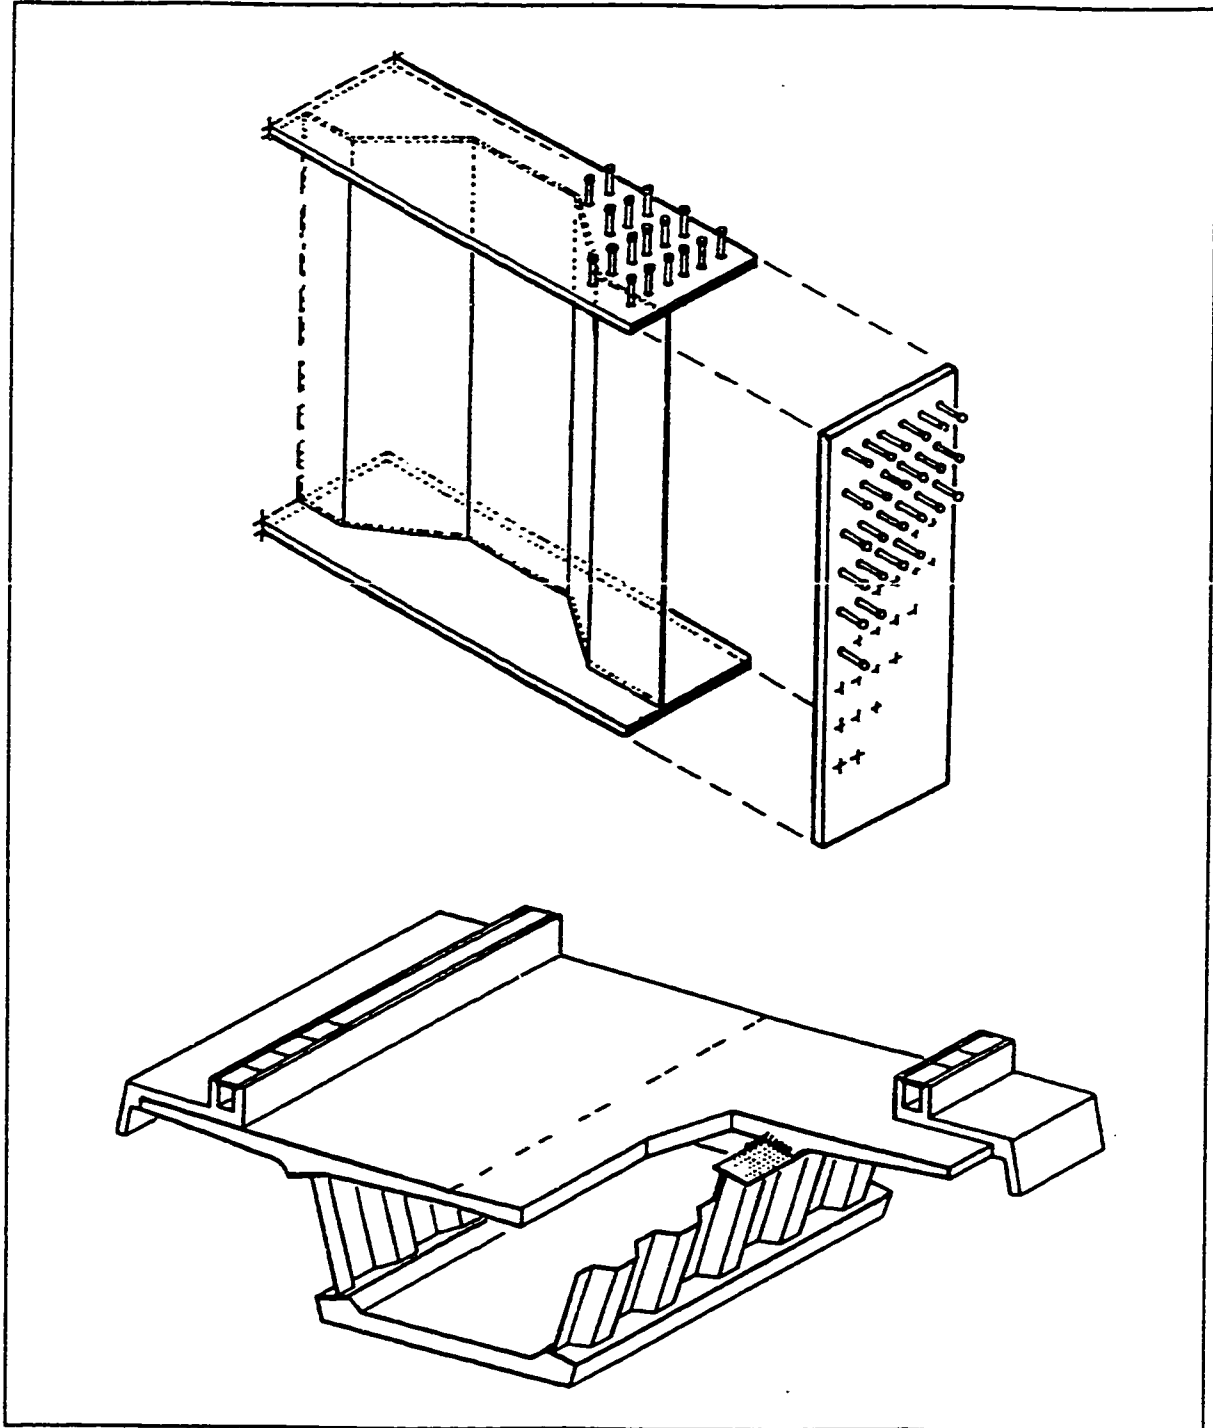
Bridge cross section proposed to the German Federal Railway, [ref. 30]
